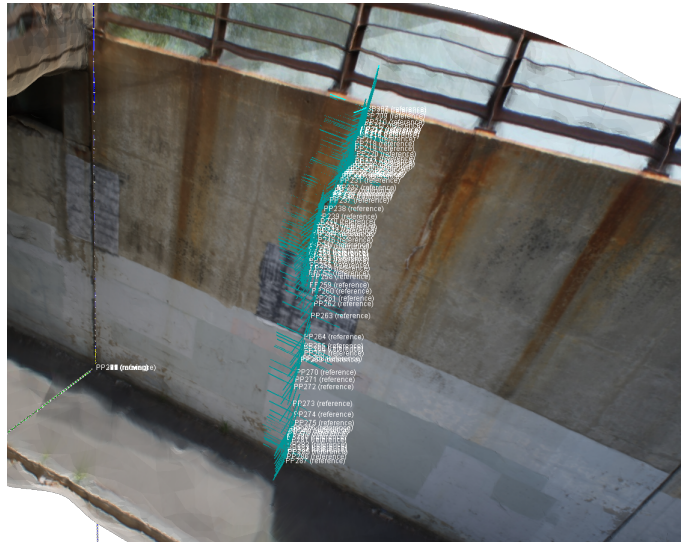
Surface crack profiling at Lincoln Street bridge, Lowell MA.
